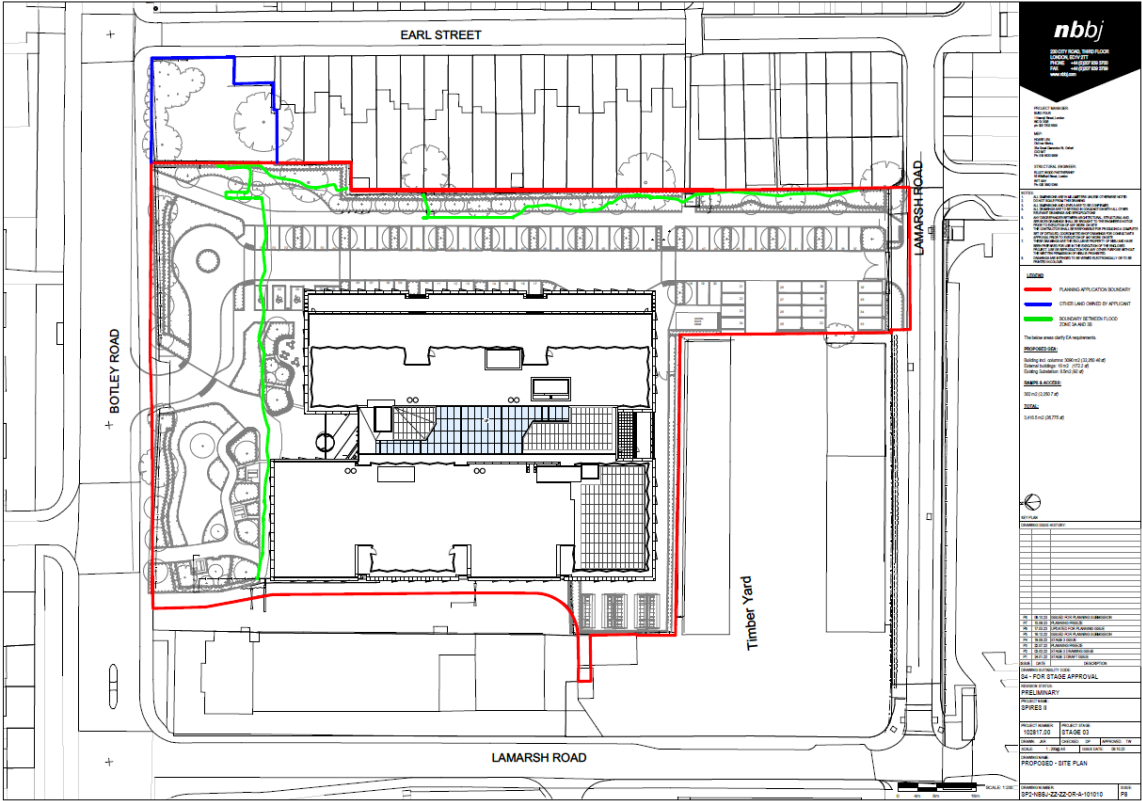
proposed block plan – red site boundary/ blue – land owned by applicant/ green – flood zone 3b
